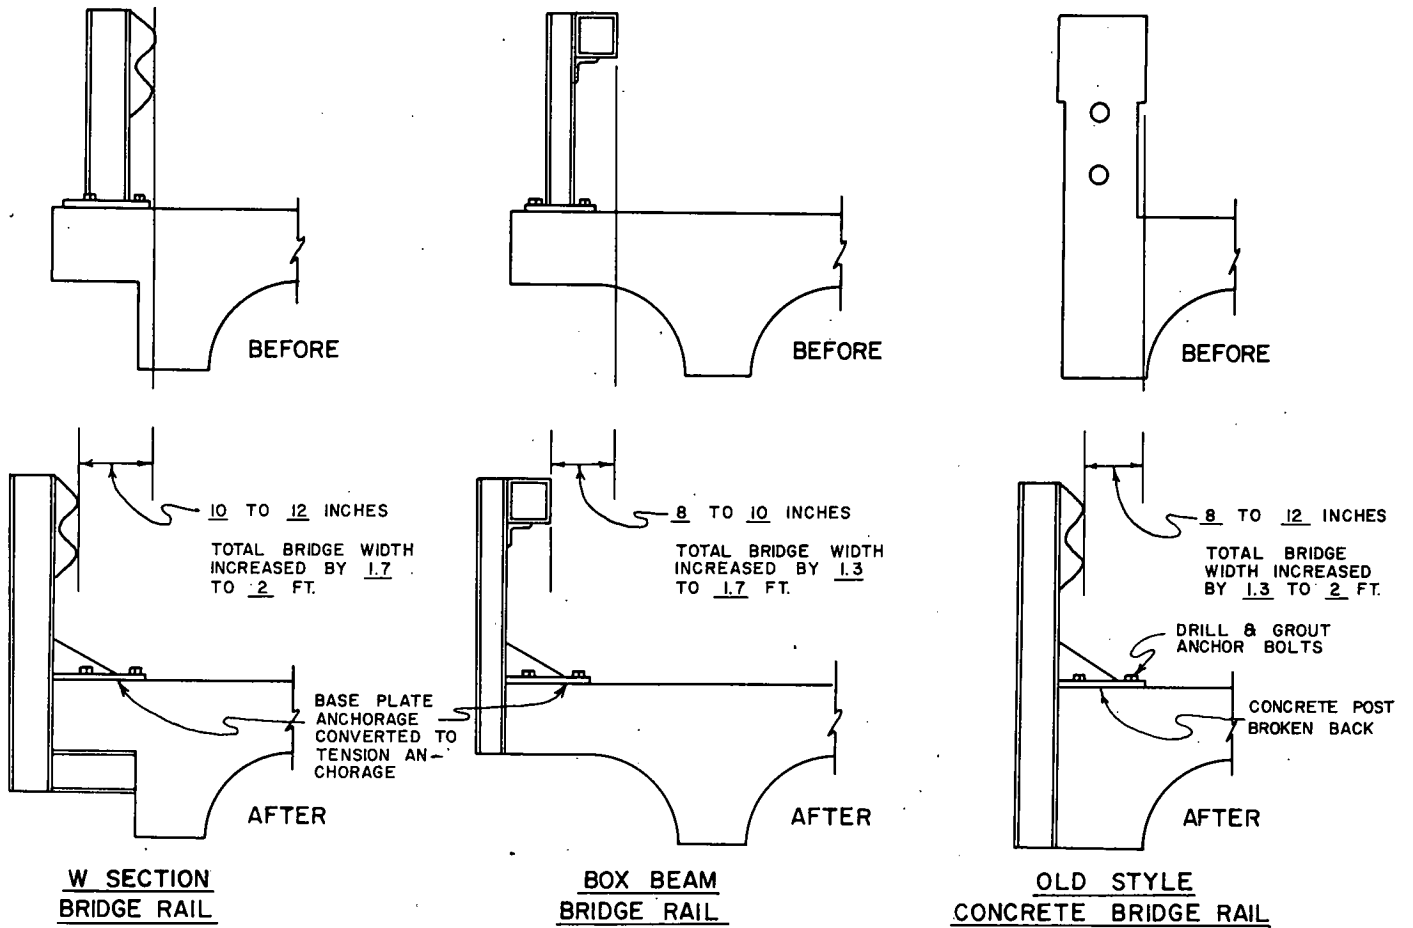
Examples of increasing effective bridge width by changing bridge rail structure without modifying basic structure.
